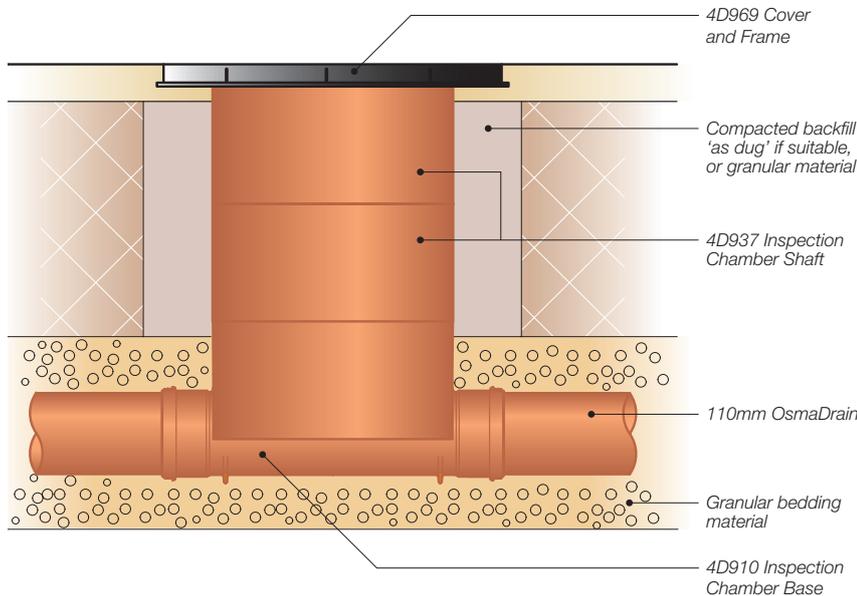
Typical installation detail: Multi-Base Inspection Chamber
